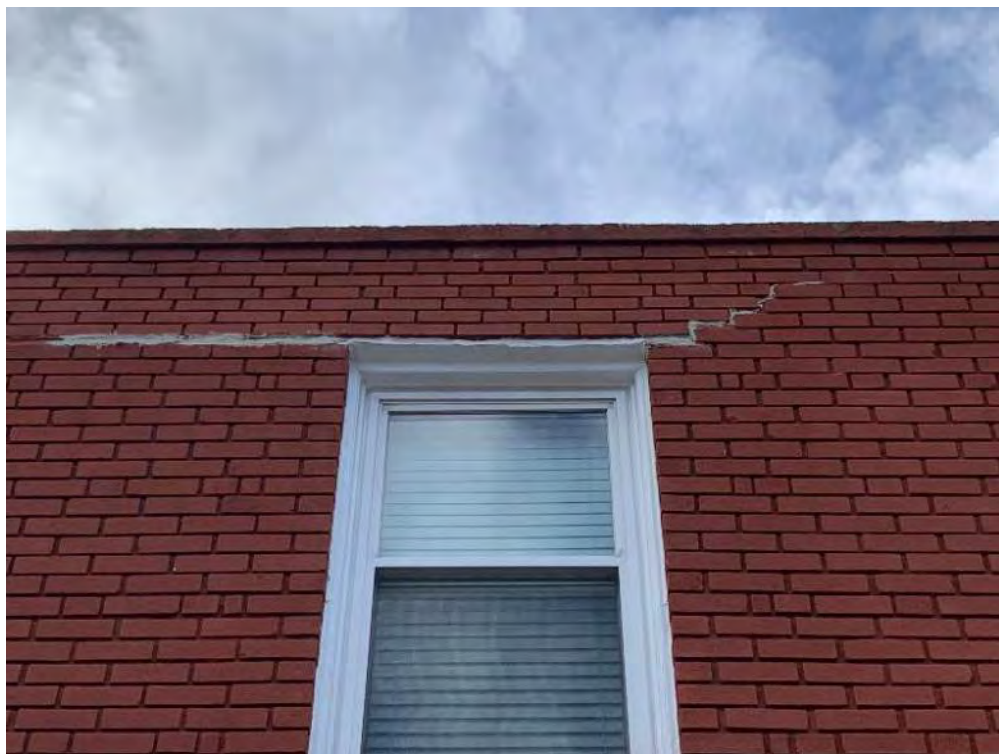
View of Brick Displacement along Interface with Adjacent Building – North Elevation
